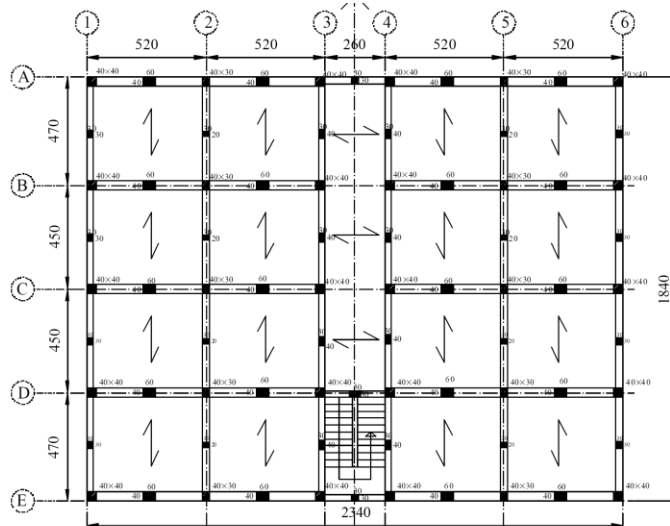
Plan view of the first and second floor and direction of ribs in the floor
